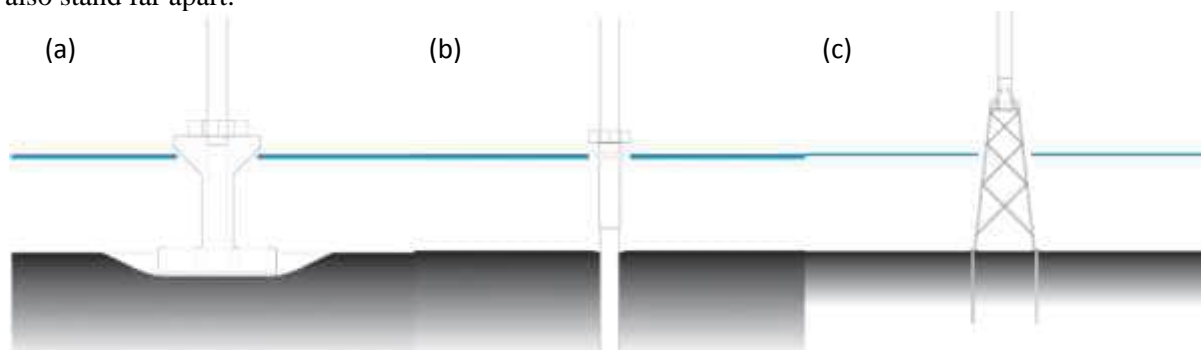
Illustrations of the three most common foundations used for offshore wind farms. (a) Concrete gravitation foundation, (b) steel monopile foundation and (c) steel jacket foundation. Illustrations modified from Hammar *et al.* (2010) with curtsy of Linus Hammar.
